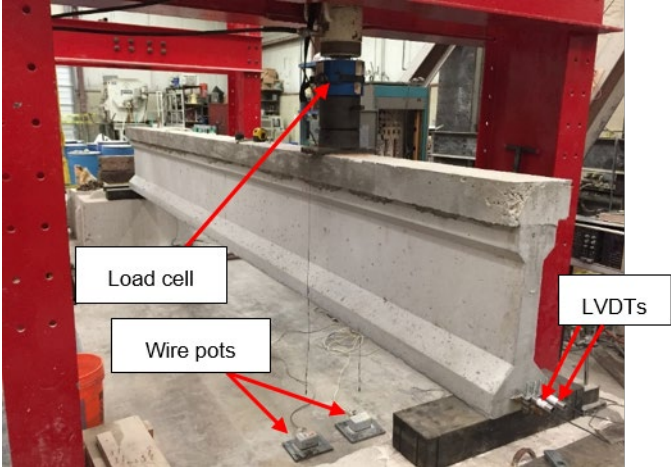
Un-cracked girder arranged in the test setup
